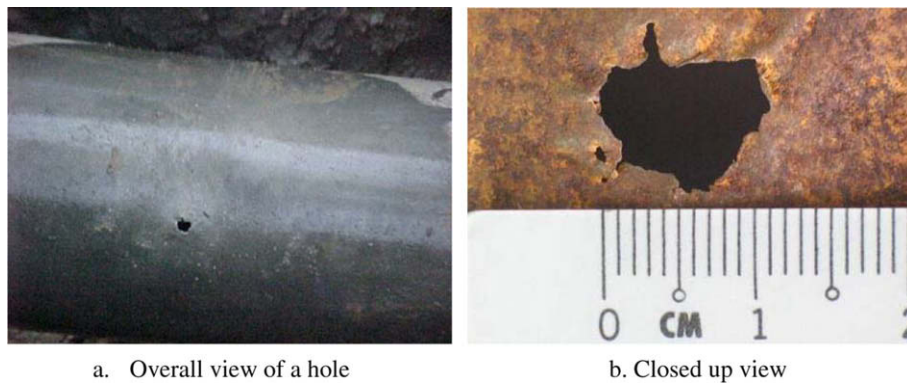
10 mm diameter of hole on API 5L X42 pipe.
